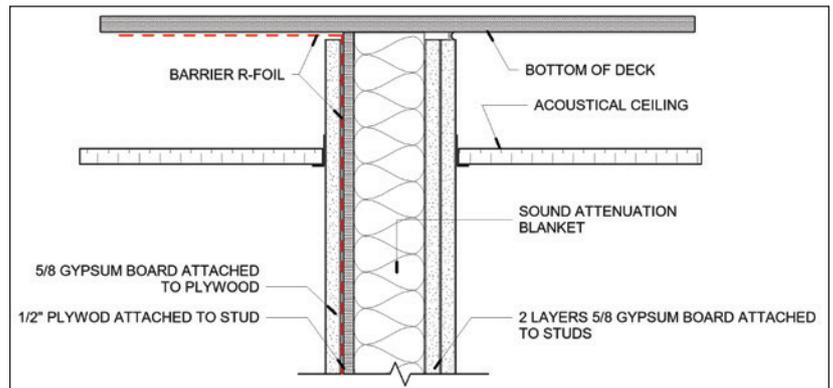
One of three wall sections presented in ICD/ICS-705 depicting an RF barrier
